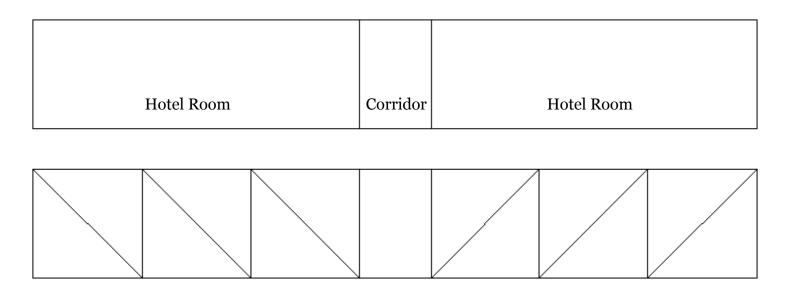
Ex. N-S Elevation and Vierendeel Truss
